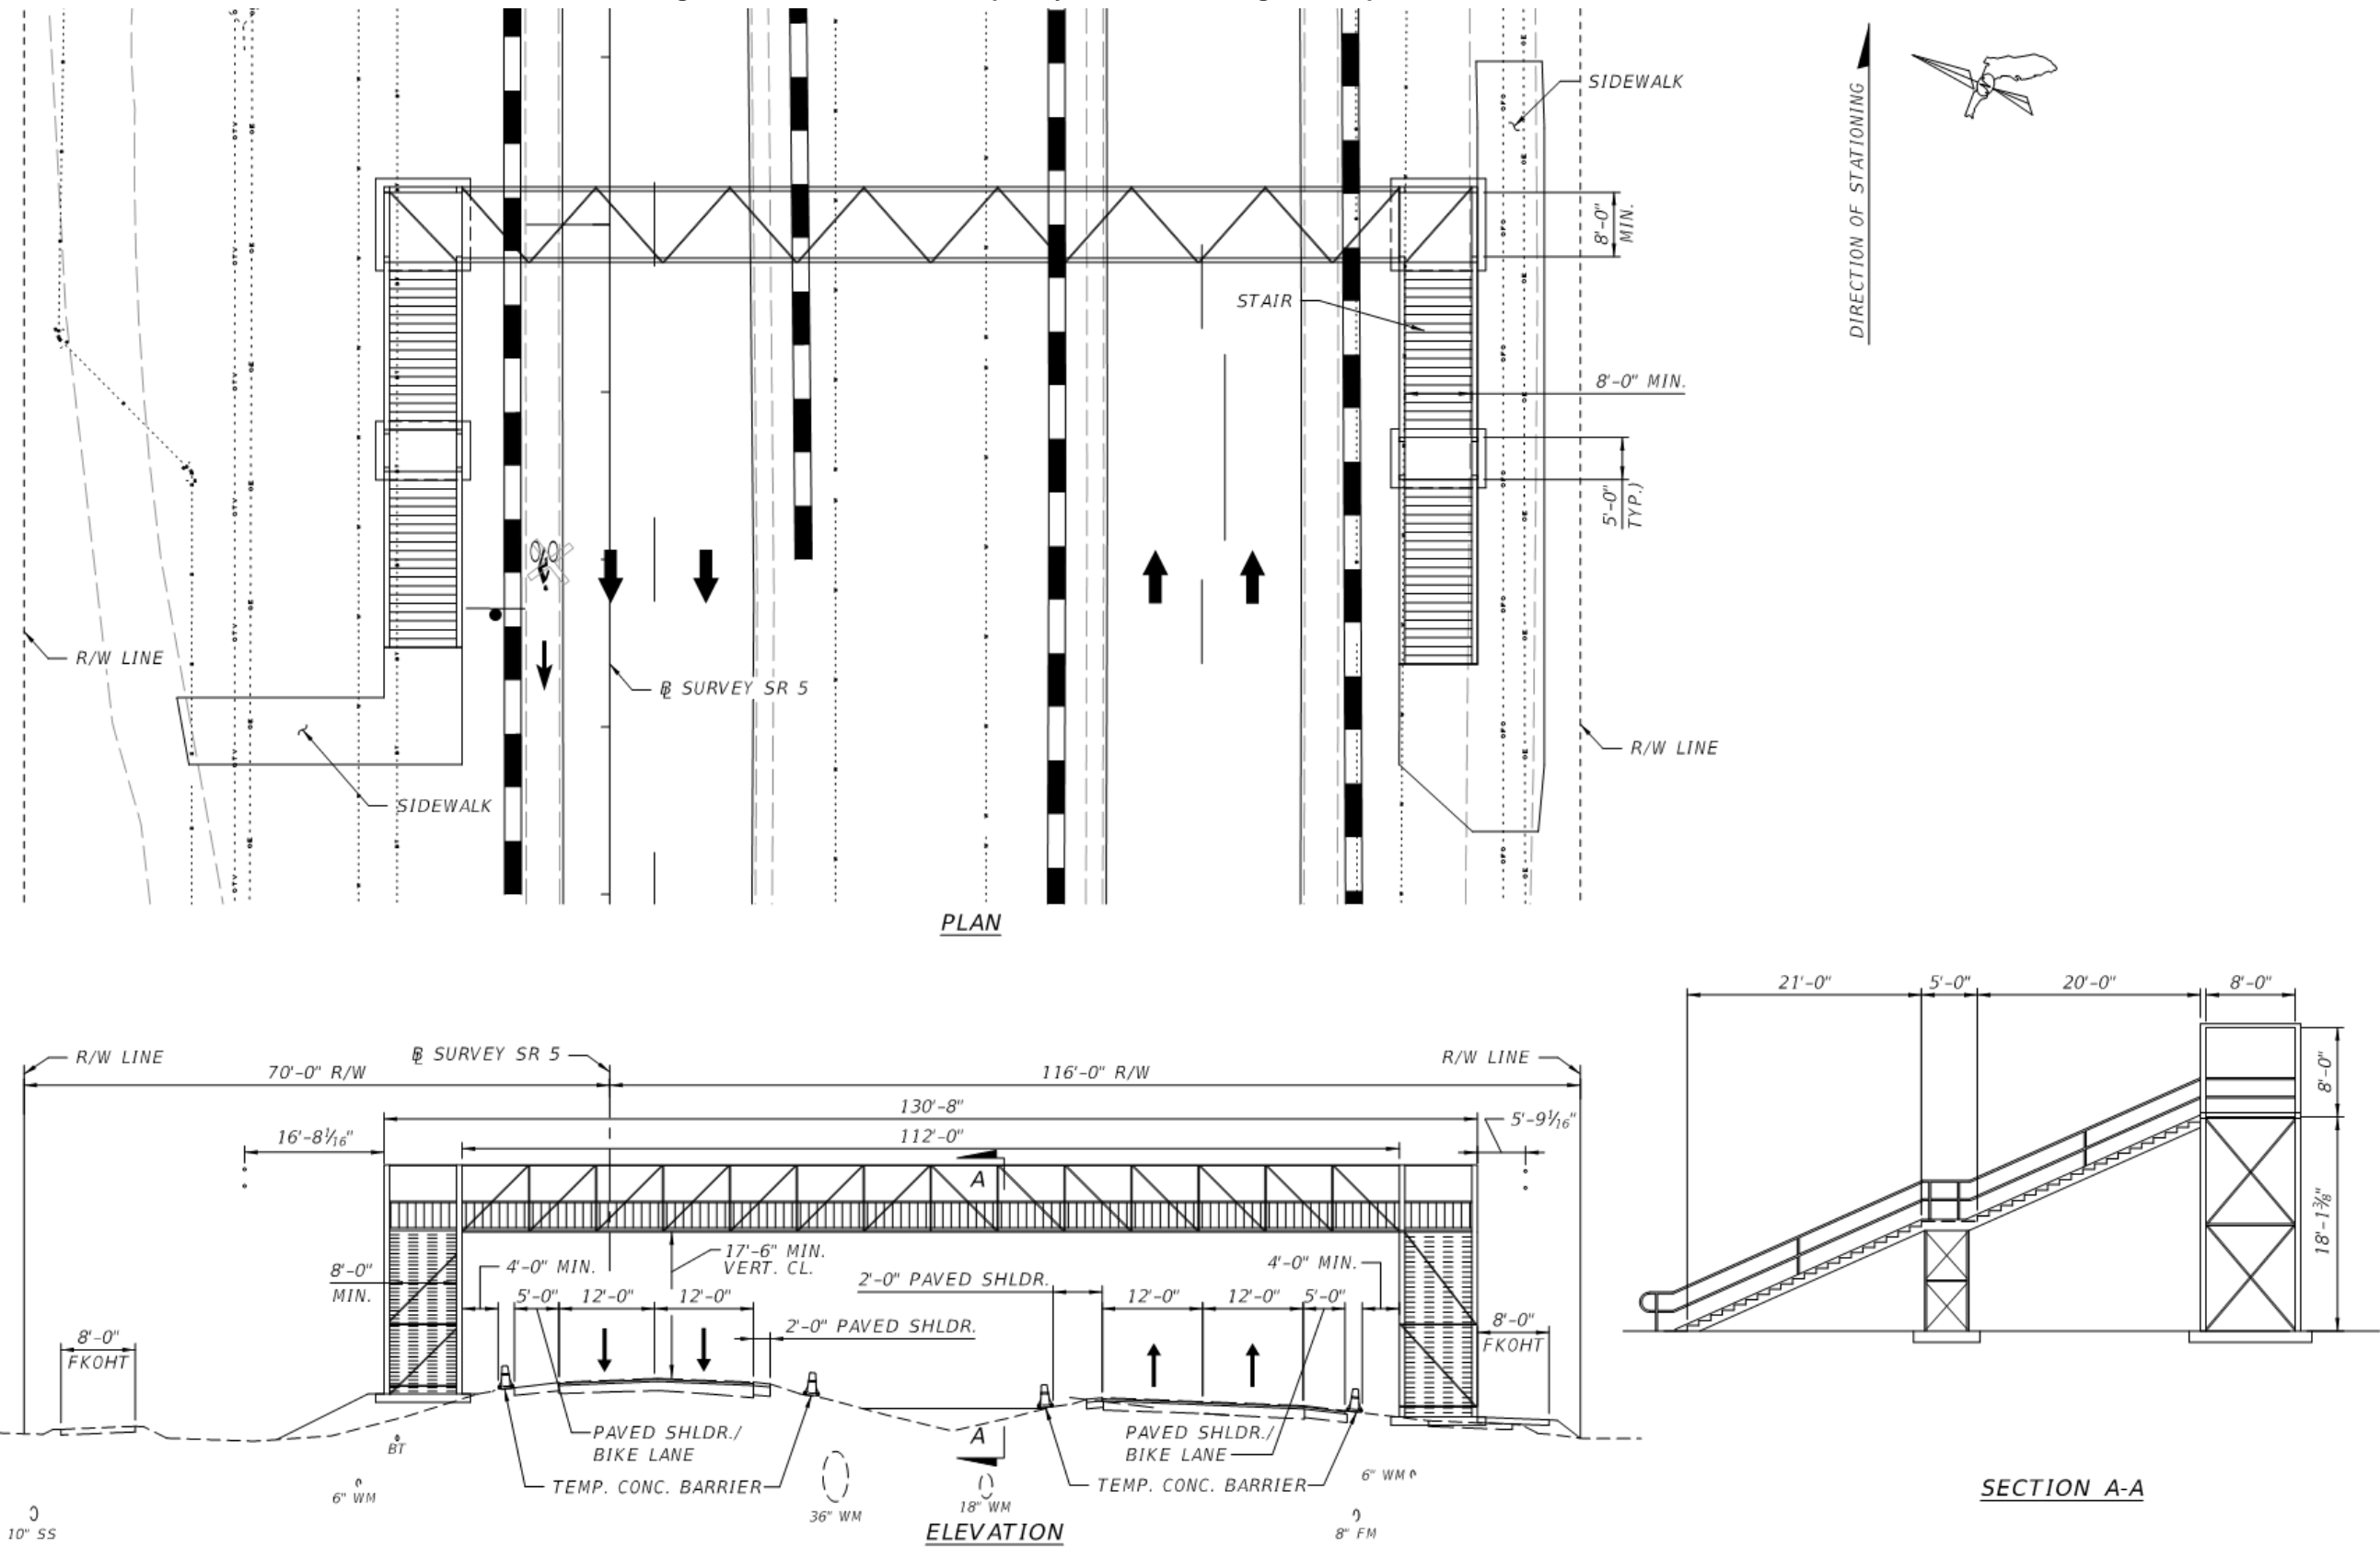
Location 3 Permanent Pedestrian Bridge Concept – Plan View
